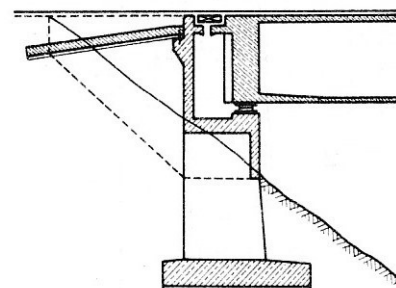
The reinforced concrete bridgehead embedded in the embankment, having the shape of a retaining wall. Transition plate in the embankment, supported at one end on the wall of the bearing niche in the abutment [2].
